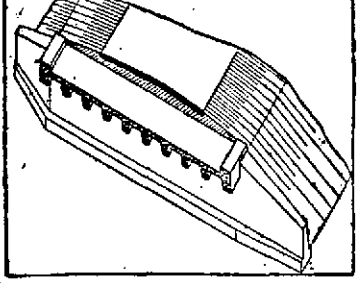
CONCRETE CULVERT STEEL I BEAMS INCASED IN CONCRETE.
